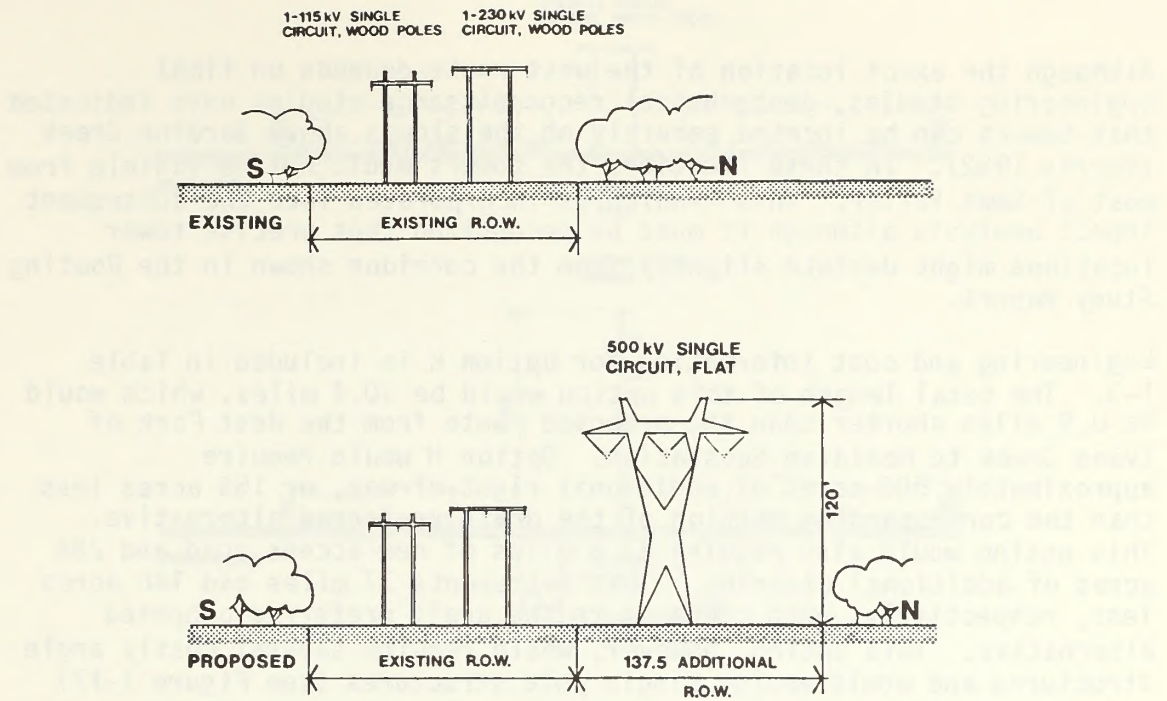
TYPICAL CORRIDORS FOR TABLE ROCK SWITCHING STATION - WHITE CITY SUBSTATION SECTION OF OPTIONS H AND I (MEDFORD BASIN WEST ROUTE AND EXISTING CORRIDOR)
